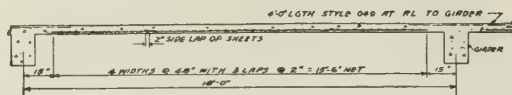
DETAILING WIDTHS OF MESH AND SHOWING EXTRA STRIP OF MESH OVER THE GIRDERS
